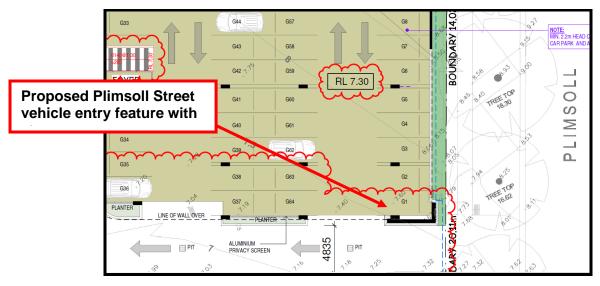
Proposed signage wall (Source: Innovate, Revision F)
